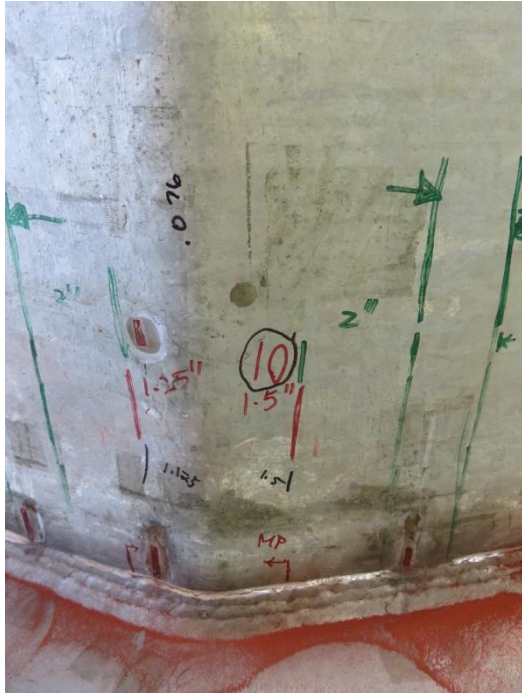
Grinding Continued to Remove Magnetic Particle Evidence of the Cracks: Specimen 33-3-12-TX-A3 – Bend 10
